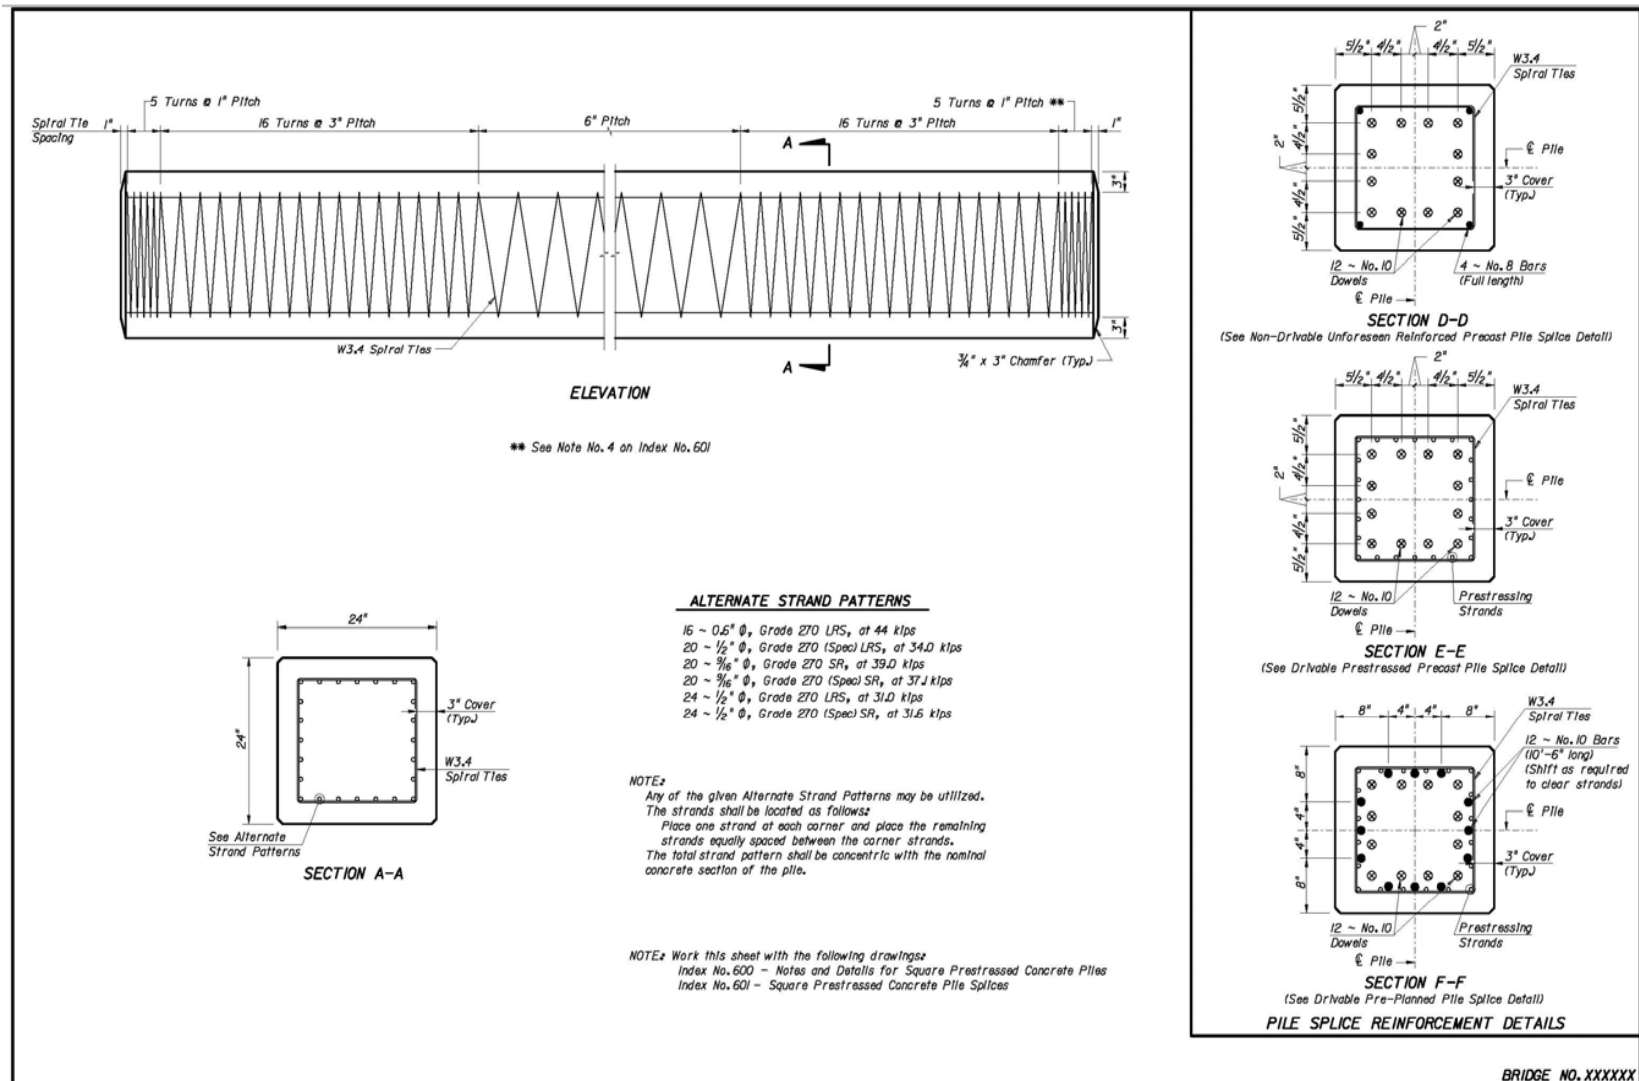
Details of 24 inch Square Prestressed Concrete Piles (Florida-DOTD 2004)
